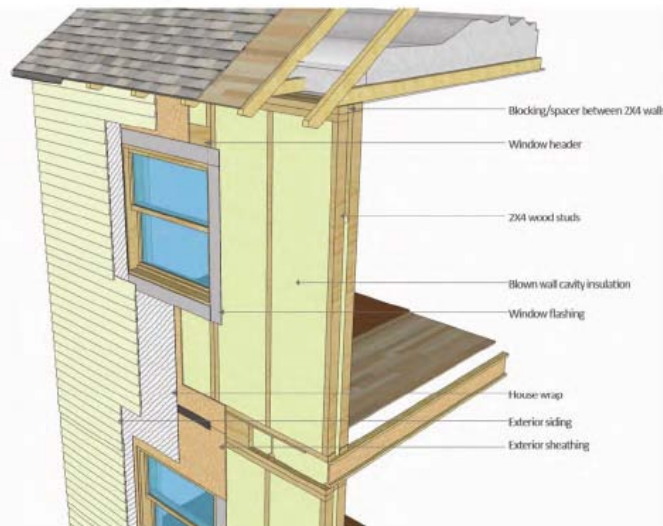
A common design of double stud wall. The thermal bridging at the floor and top plate can be seen in this Building America prototype design (Aldrich et al, 2010).
